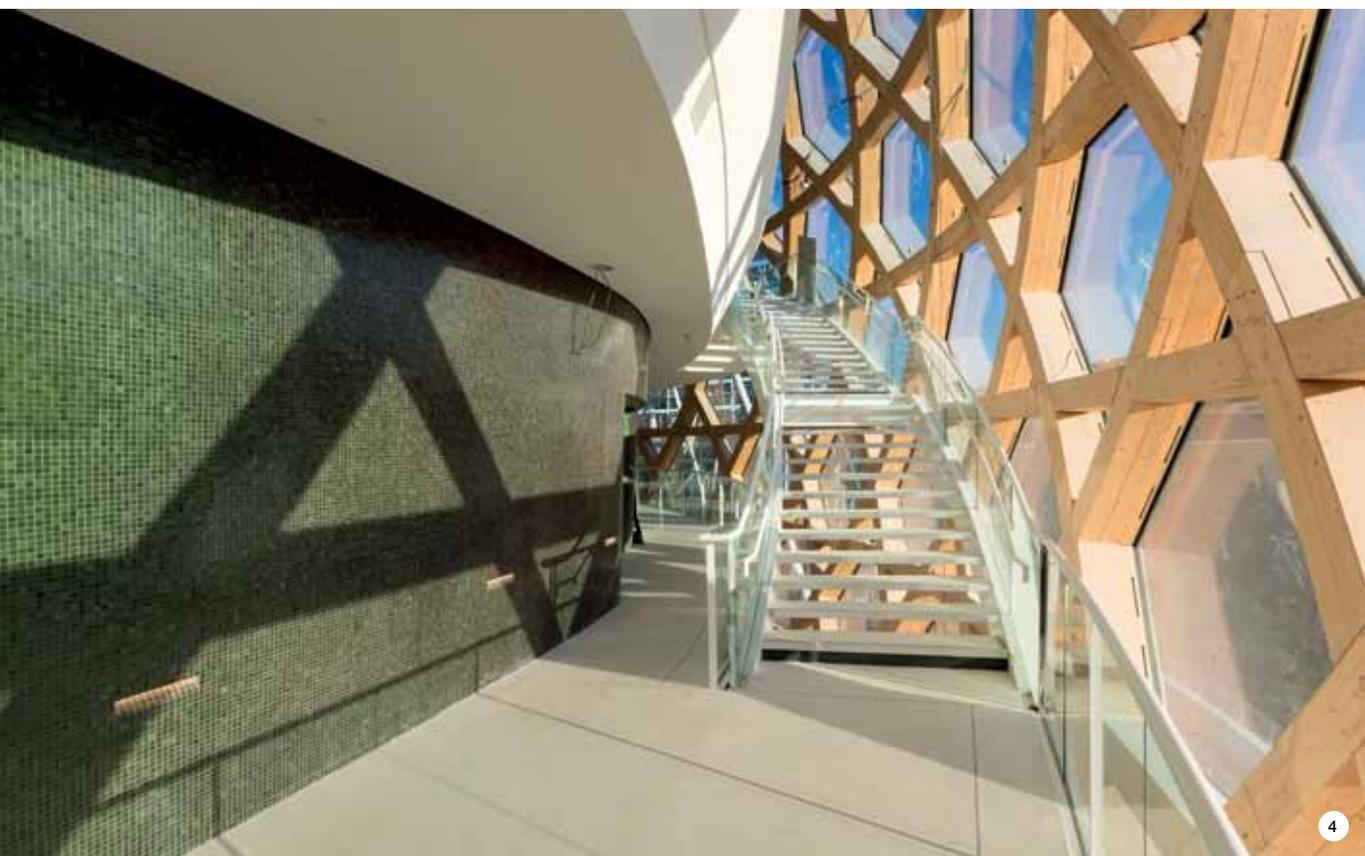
MAPEFLOOR SYSTEM TERRAZZO was used to finish the corridors next to the concert hall and the auditorium.
